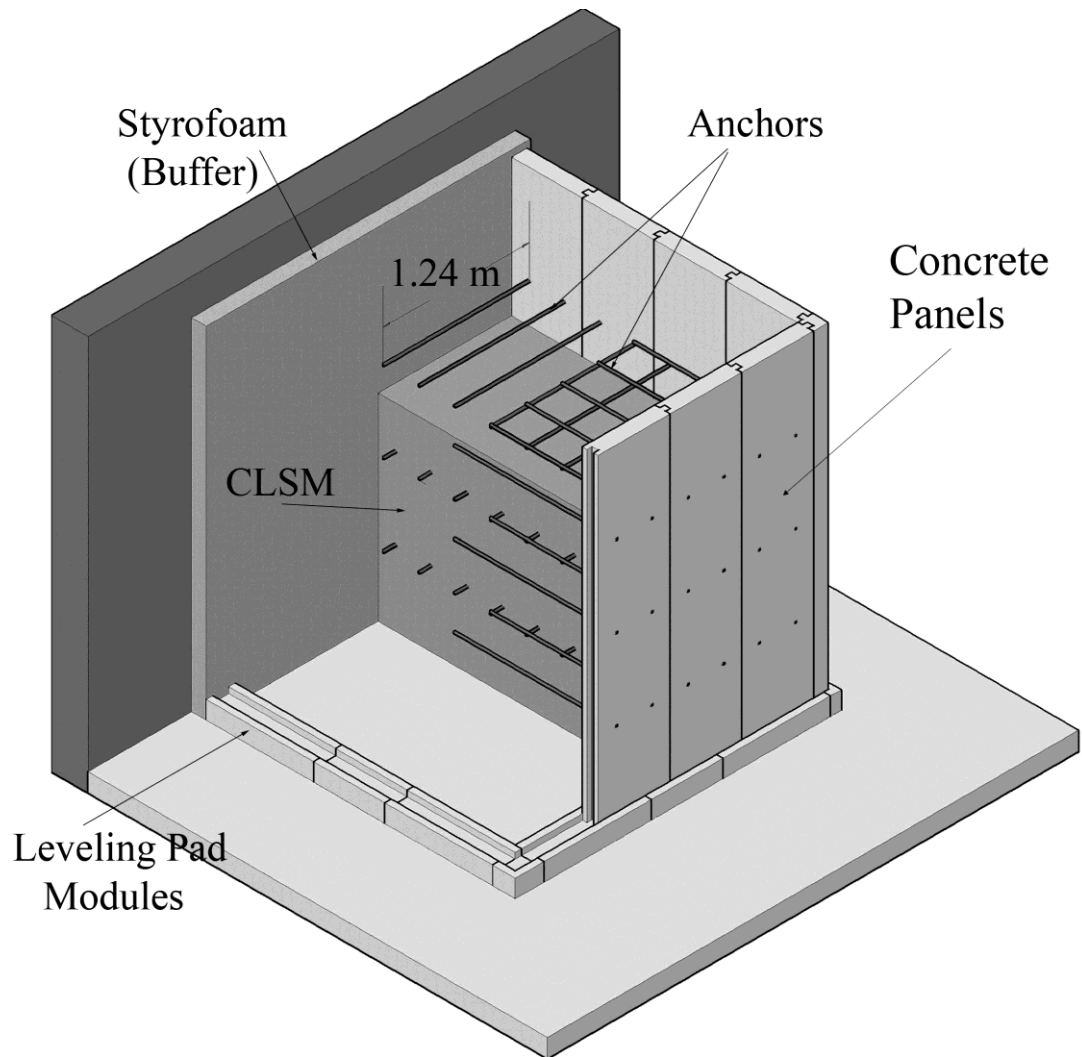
Design of a CLSM abutment and location of embedded anchors.
